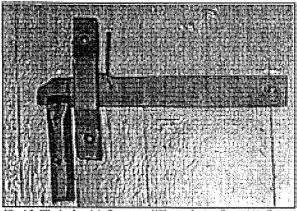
Wooden Latch in Basement of Western Section, Roson 064, Door 1 204.
